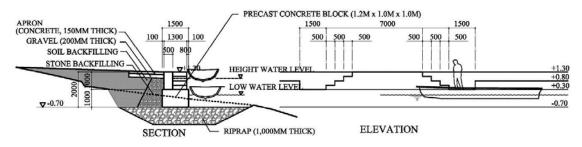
Plan of Stair-shaped Parts at Seawall
